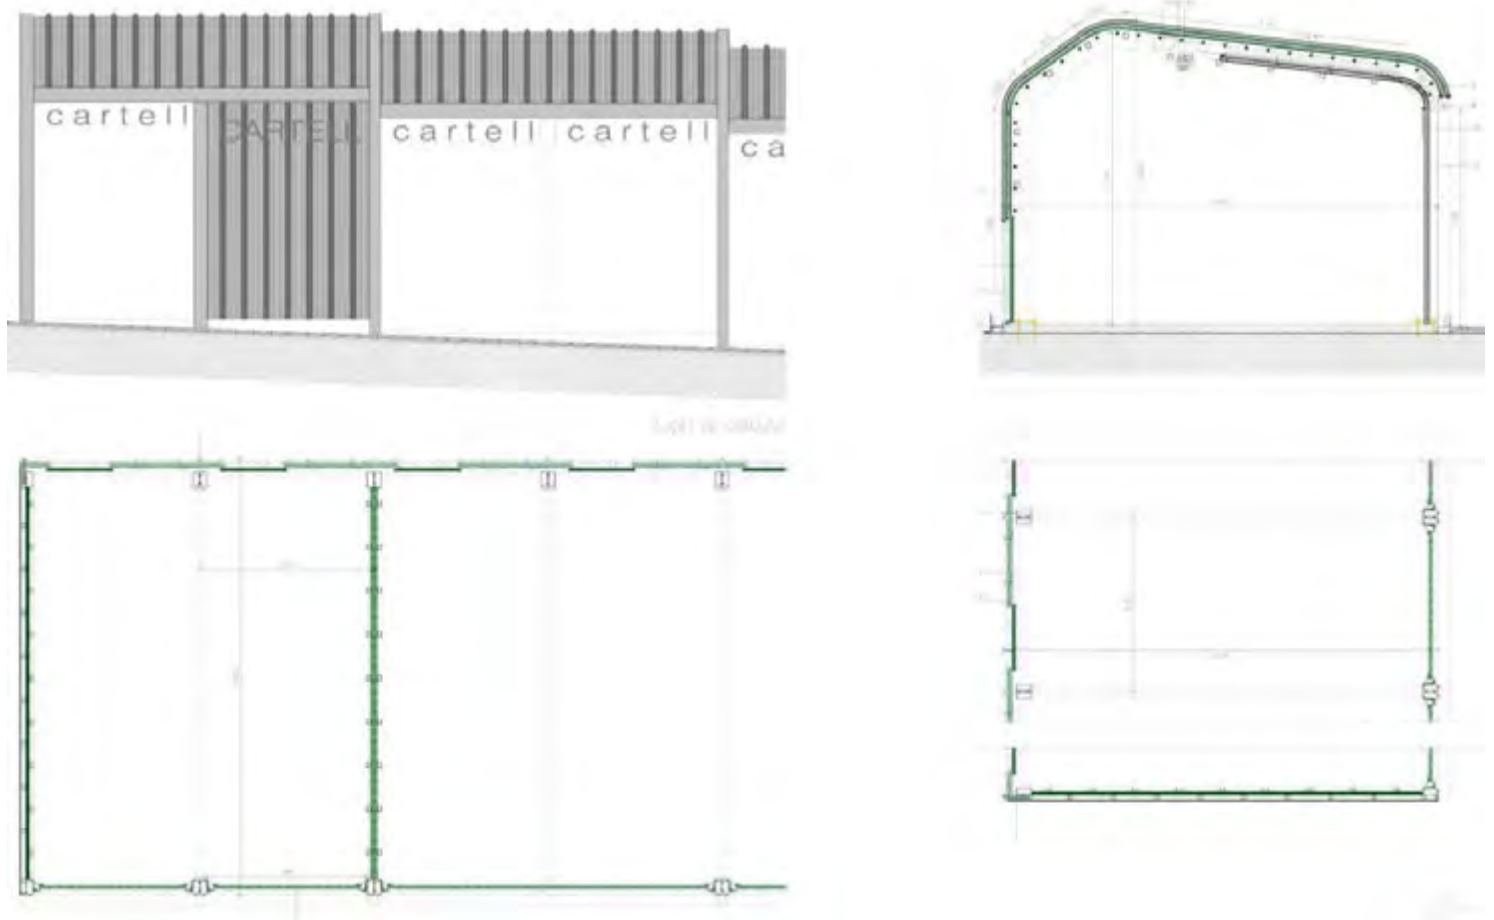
Shops of 5.0 x 2.0 x 3.5 m – Structures
